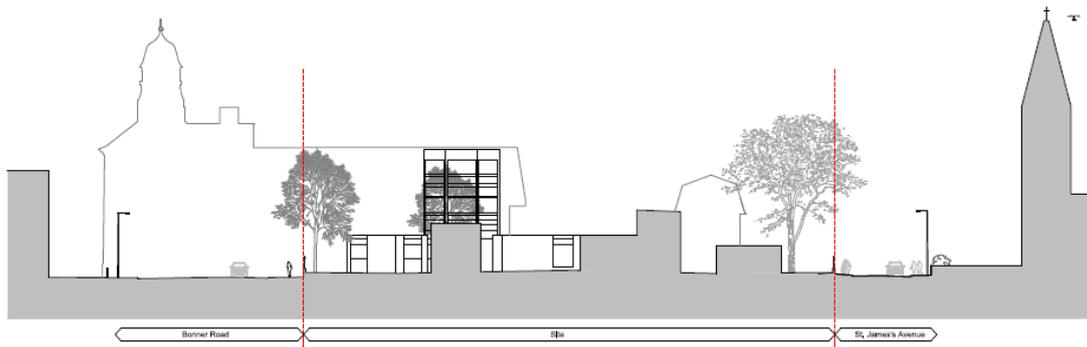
Existing site cross section – Bonner Road to St James’s Avenue
